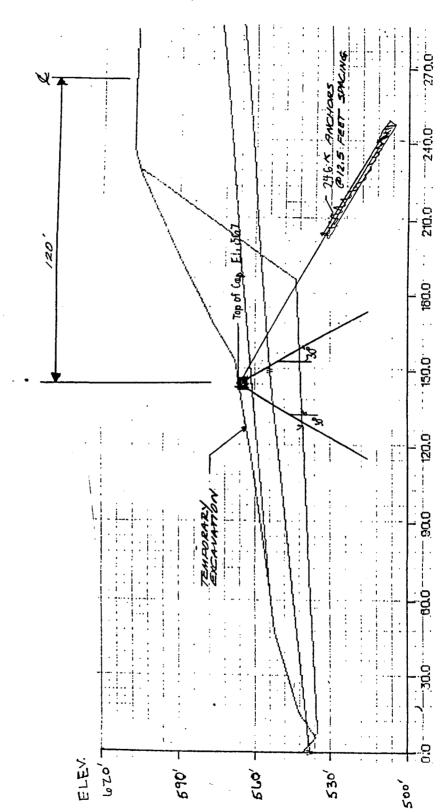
Typical cross-section of the slide. (Wolosick, 1994)
